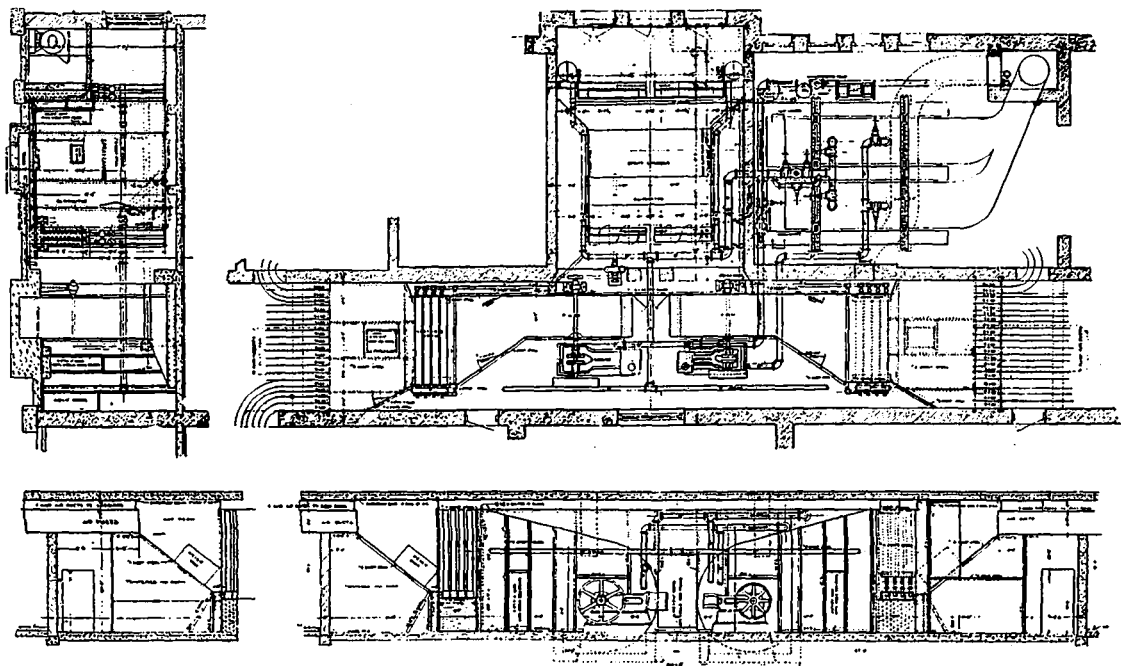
WILLIAM CLARK SCHOOL, ST. LOUIS, MO. PLAN OF HEATING AND VENTILATION, SHOWING DETAILED ARRANGEMENT OF FANS, BOILERS, ETC. WILLIAM ITTNER, ARCHITECT, AND CLAUDE A. BULKELEY, CHIEF ENGINEER.
